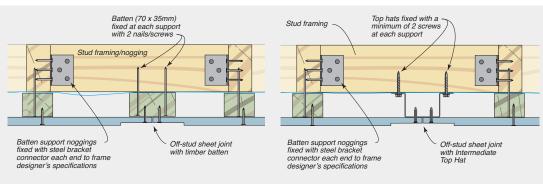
Fixing of Sheets to Battens on the Framing
